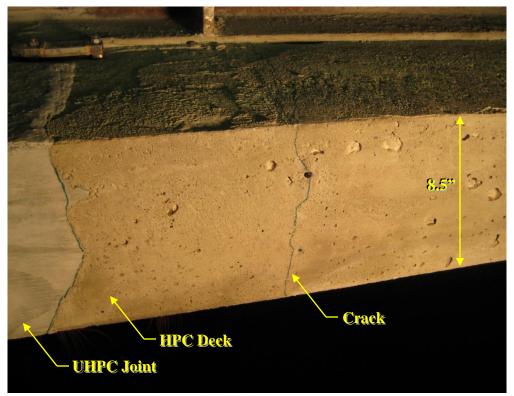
Full Depth Cracking in Precast Deck
